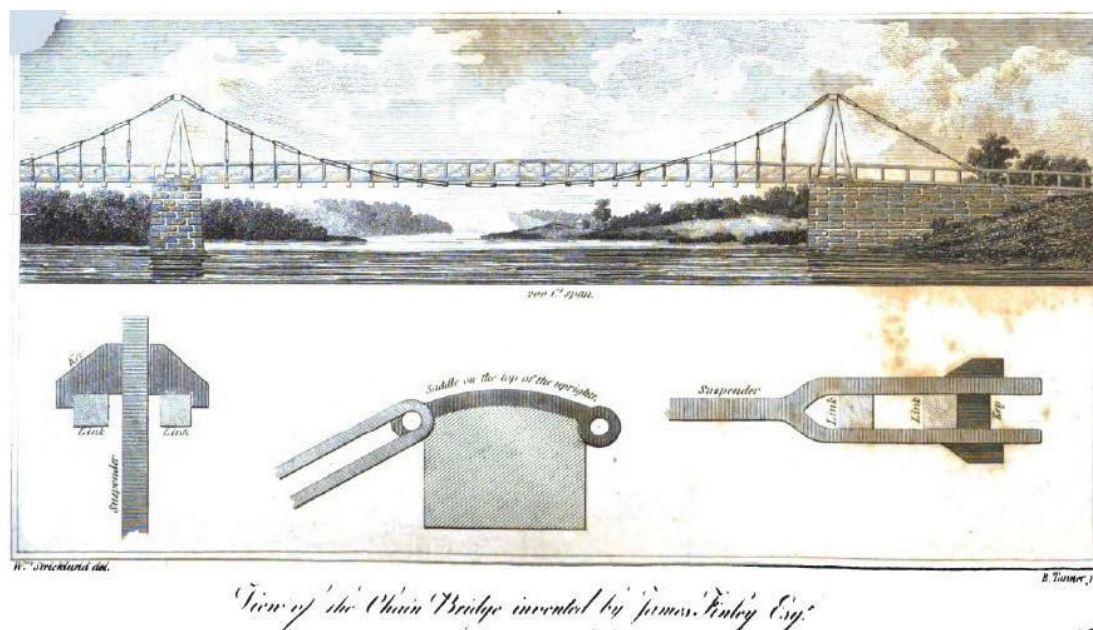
Jacob's Creek Bridge, 1801, South of Mount Pleasant, Pennsylvania.
